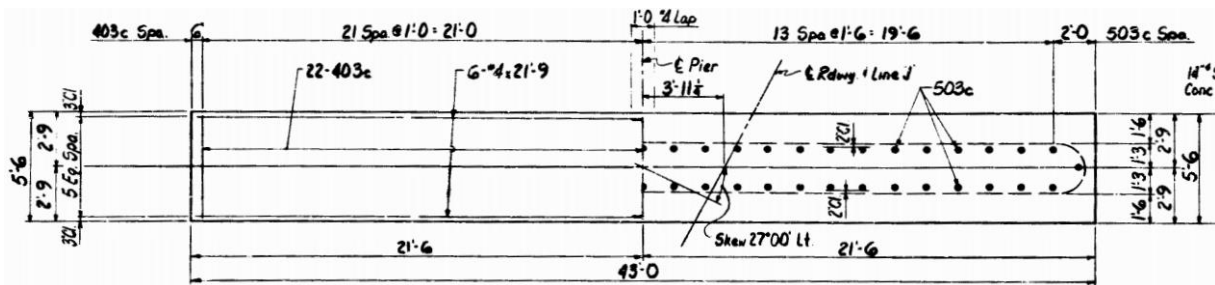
Cross-Section of Typical Interior Pier of Structure 052-24-06649 (NBI 19430) (INDOT, 1982)
